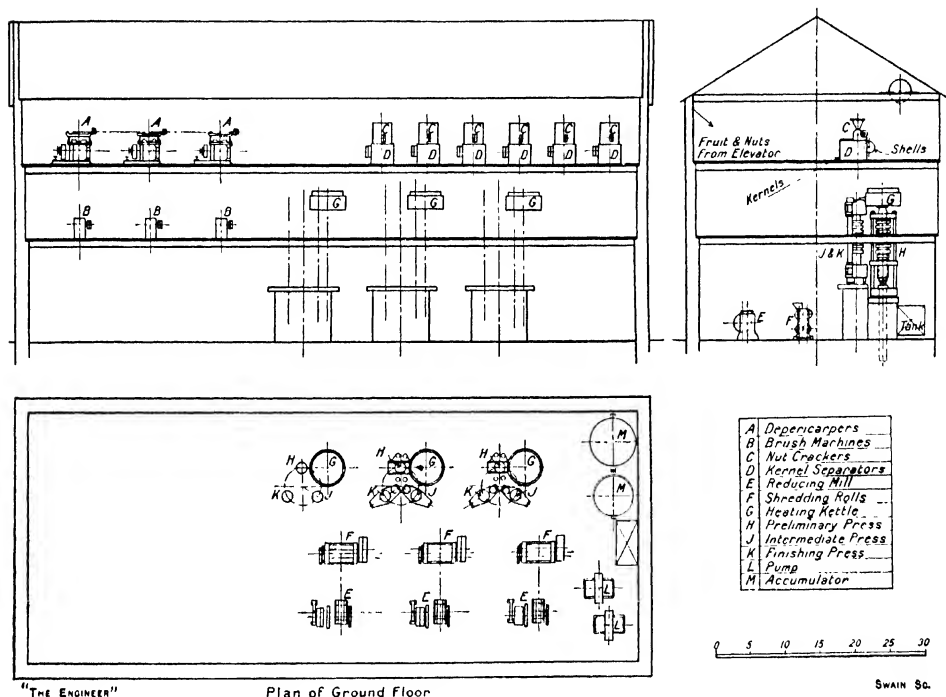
Palm and Palm Kernel Oil Mill—Craig.
